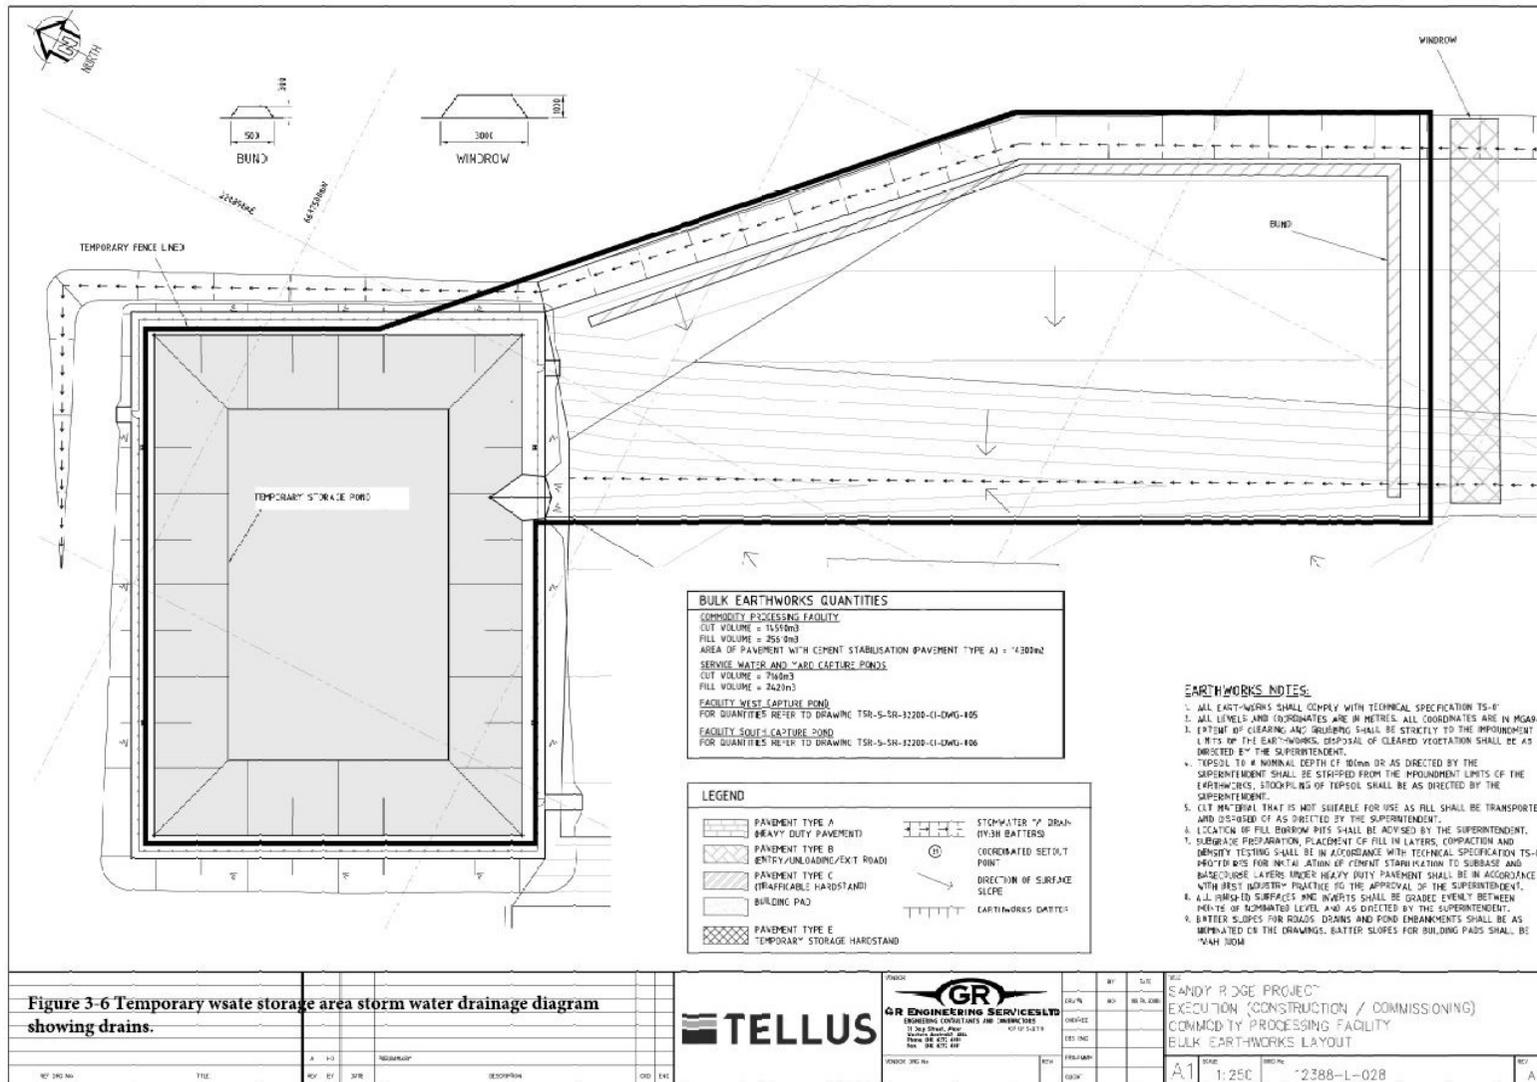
Temporary Waste Storage Area – drainage and bunding detail
